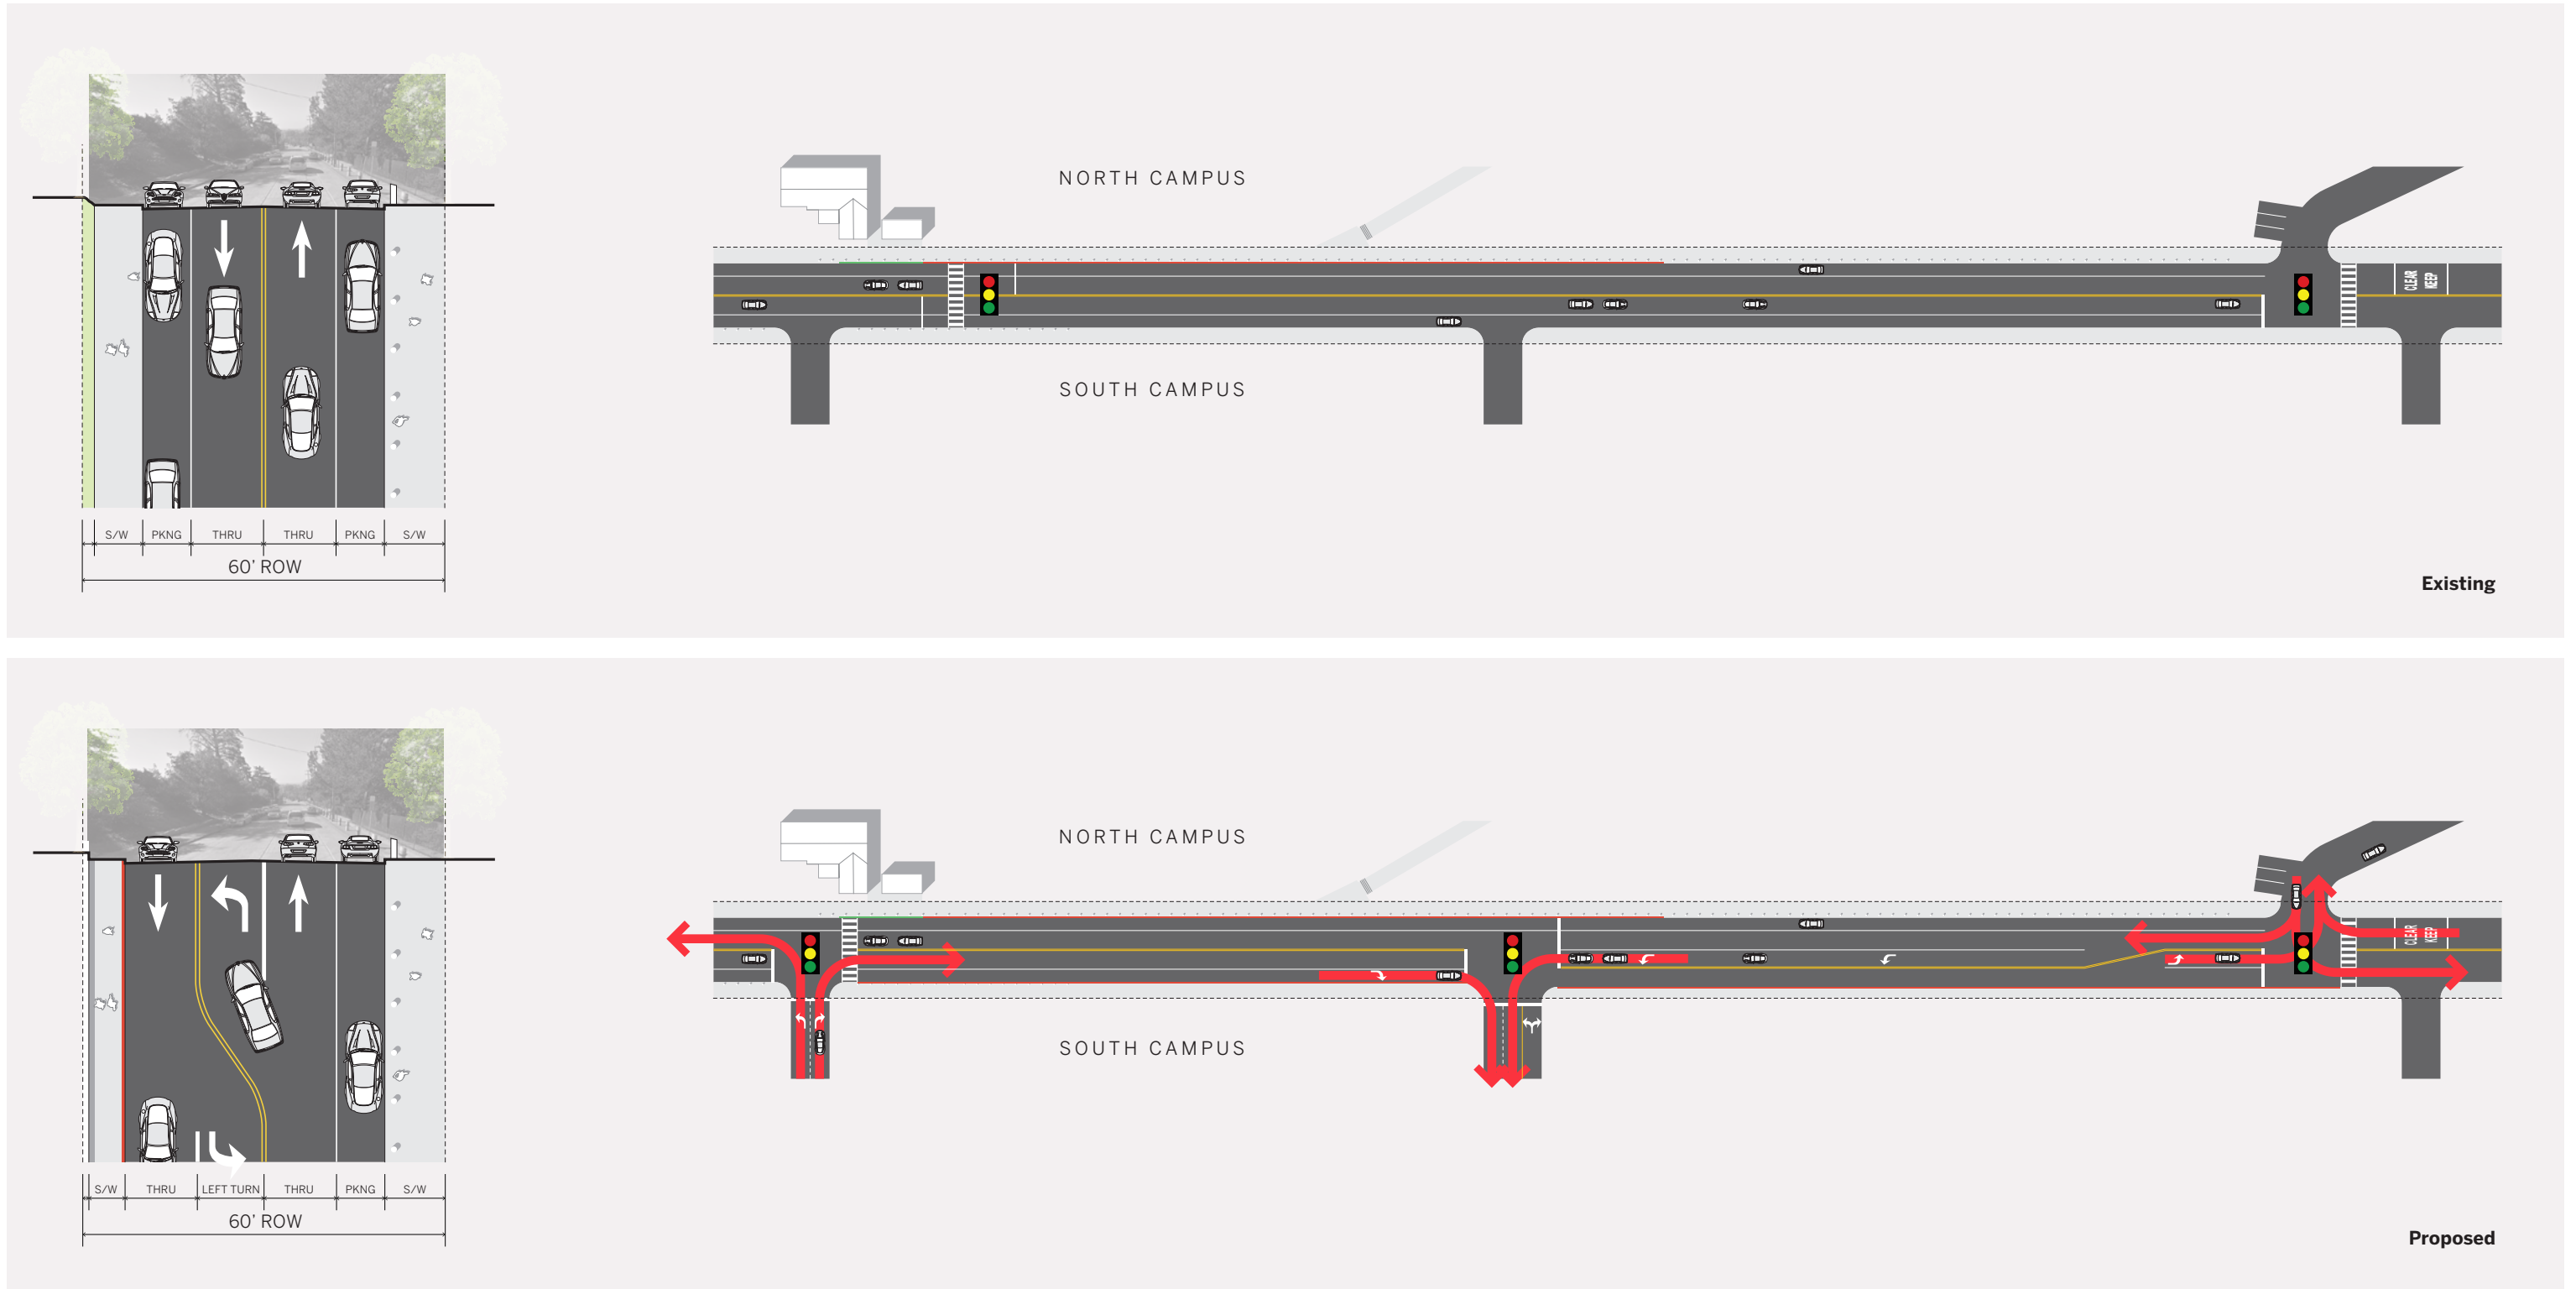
Proposed & Existing Lincoln Avenue Alignments
